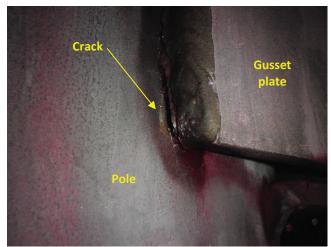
Crack in weld at gusset plate at mast arm to pole connection
